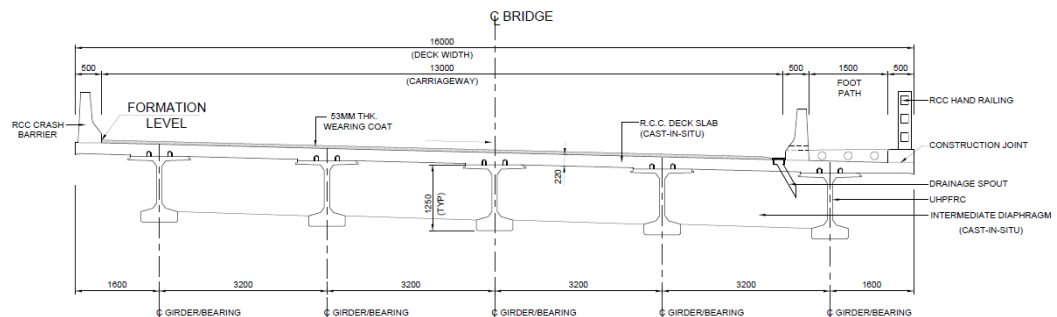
27 Cross section of 30m span UHPFRC post tensioned I girder at mid span
